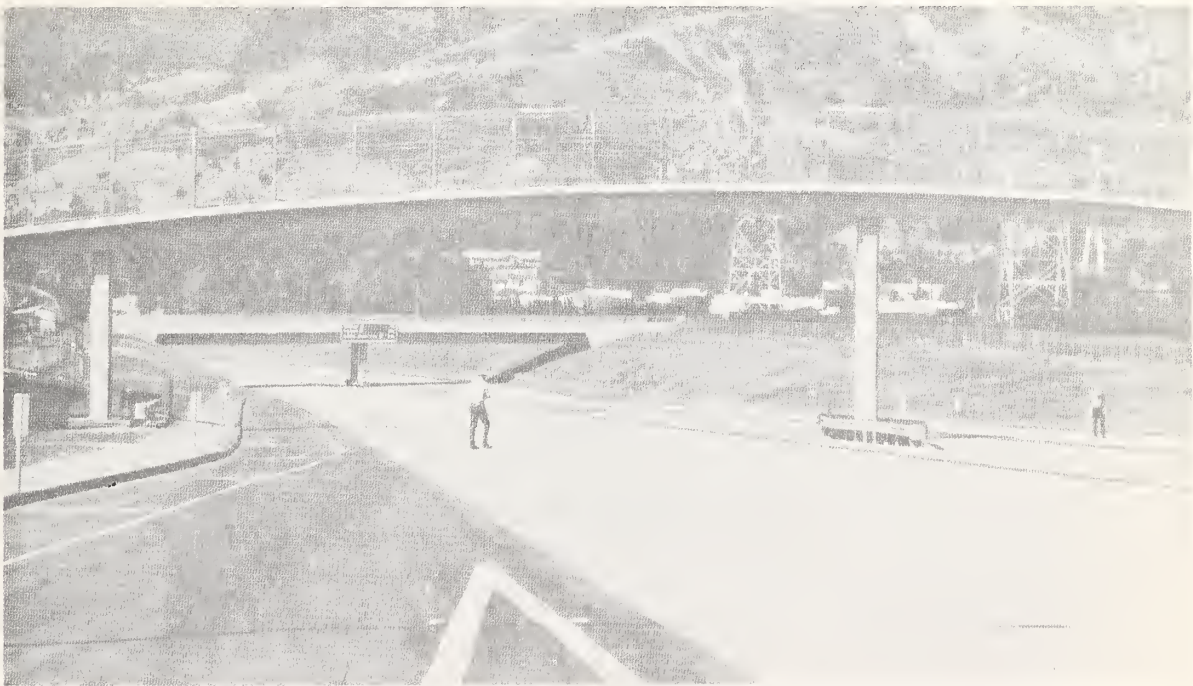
Tyler Street Pedestrian Overcrossing at
